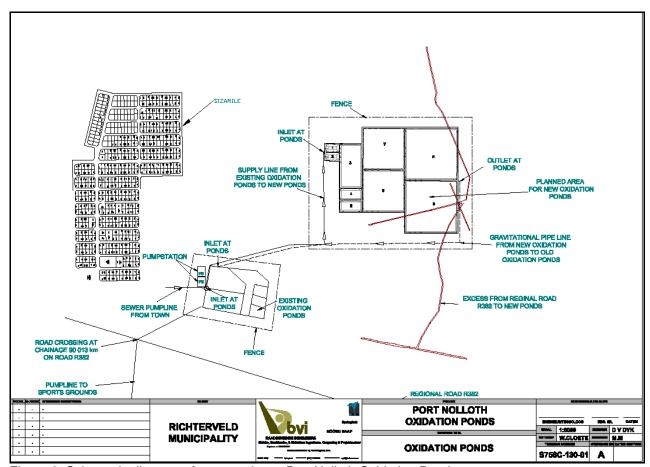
Schematic diagram of proposed new Port Nolloth Oxidation Ponds
